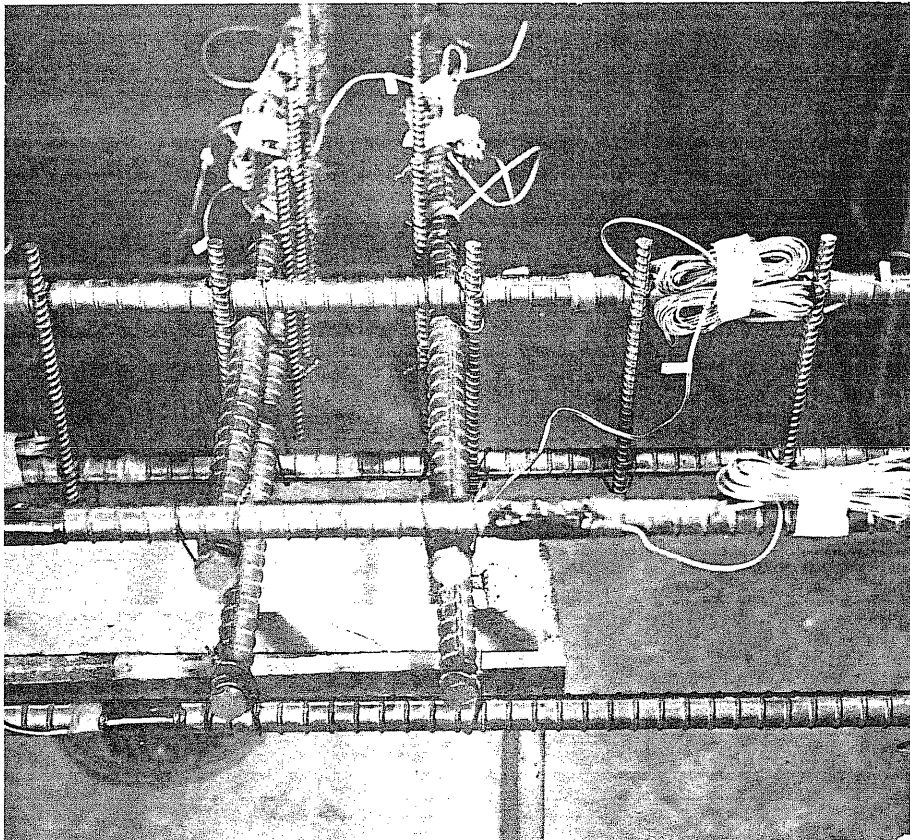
PHOTOGRAPH OF REINFORCEMENT AT INTERIOR COLUMN-
